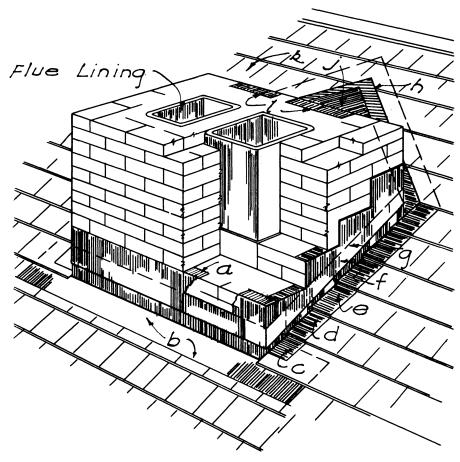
Flashing at a chimney located on the slope of a roof. Sheet metal (h), over cricket (j), extends at least 4 inches under the shingles (k), and is counterflashed at l in joint. Base flashings (b, c, d, and e) and cap flashings (a, f, and g) lap over the base flashings to provide watertight construction. A full bed of mortar should be provided where cap flashing is inserted in joints.
